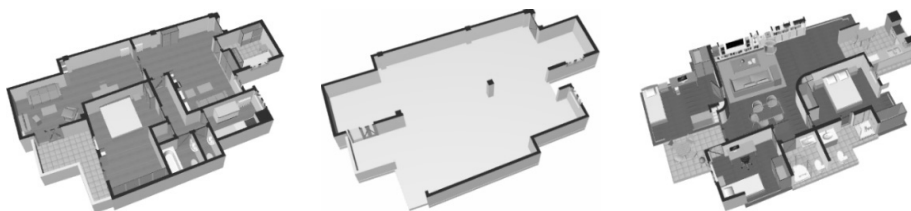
Renovation filters. Existing plan, after demolition, new construction (Fontan, 2016).
